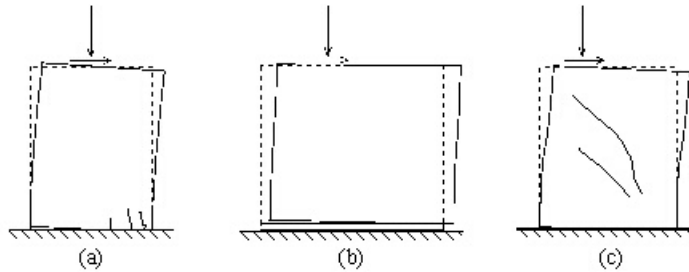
Damage mechanisms in the masonry plane: Flexural, Combined compressive and bending stress (a), Shear and sliding (b) and shear and diagonal cracking (c) (Magenes et al., 2000)
